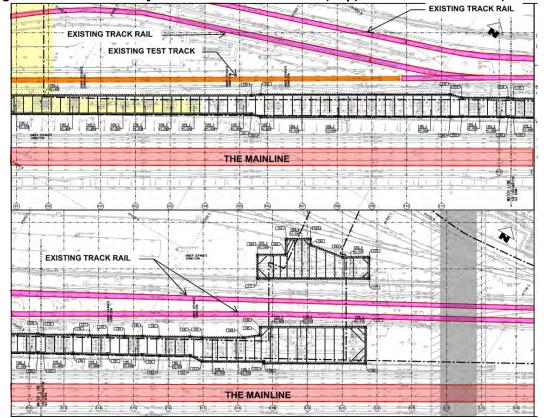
Sheet Pile Layout Plan – G.L. 99-112/P-Q (Top) and G.L. 112-122/P-Q (Bottom)
